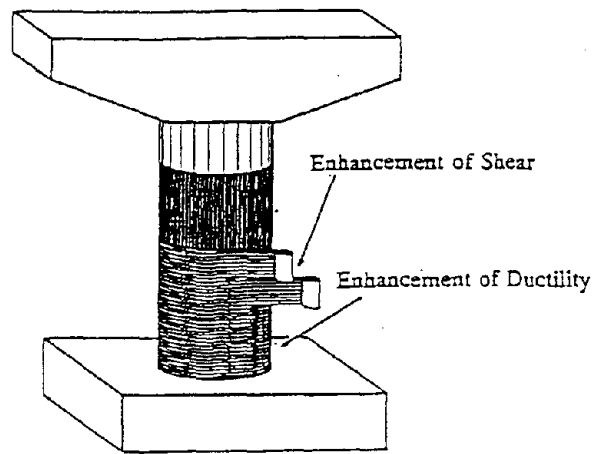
Application of New Materilas for Seismic Retrofit of Reinforced Column
